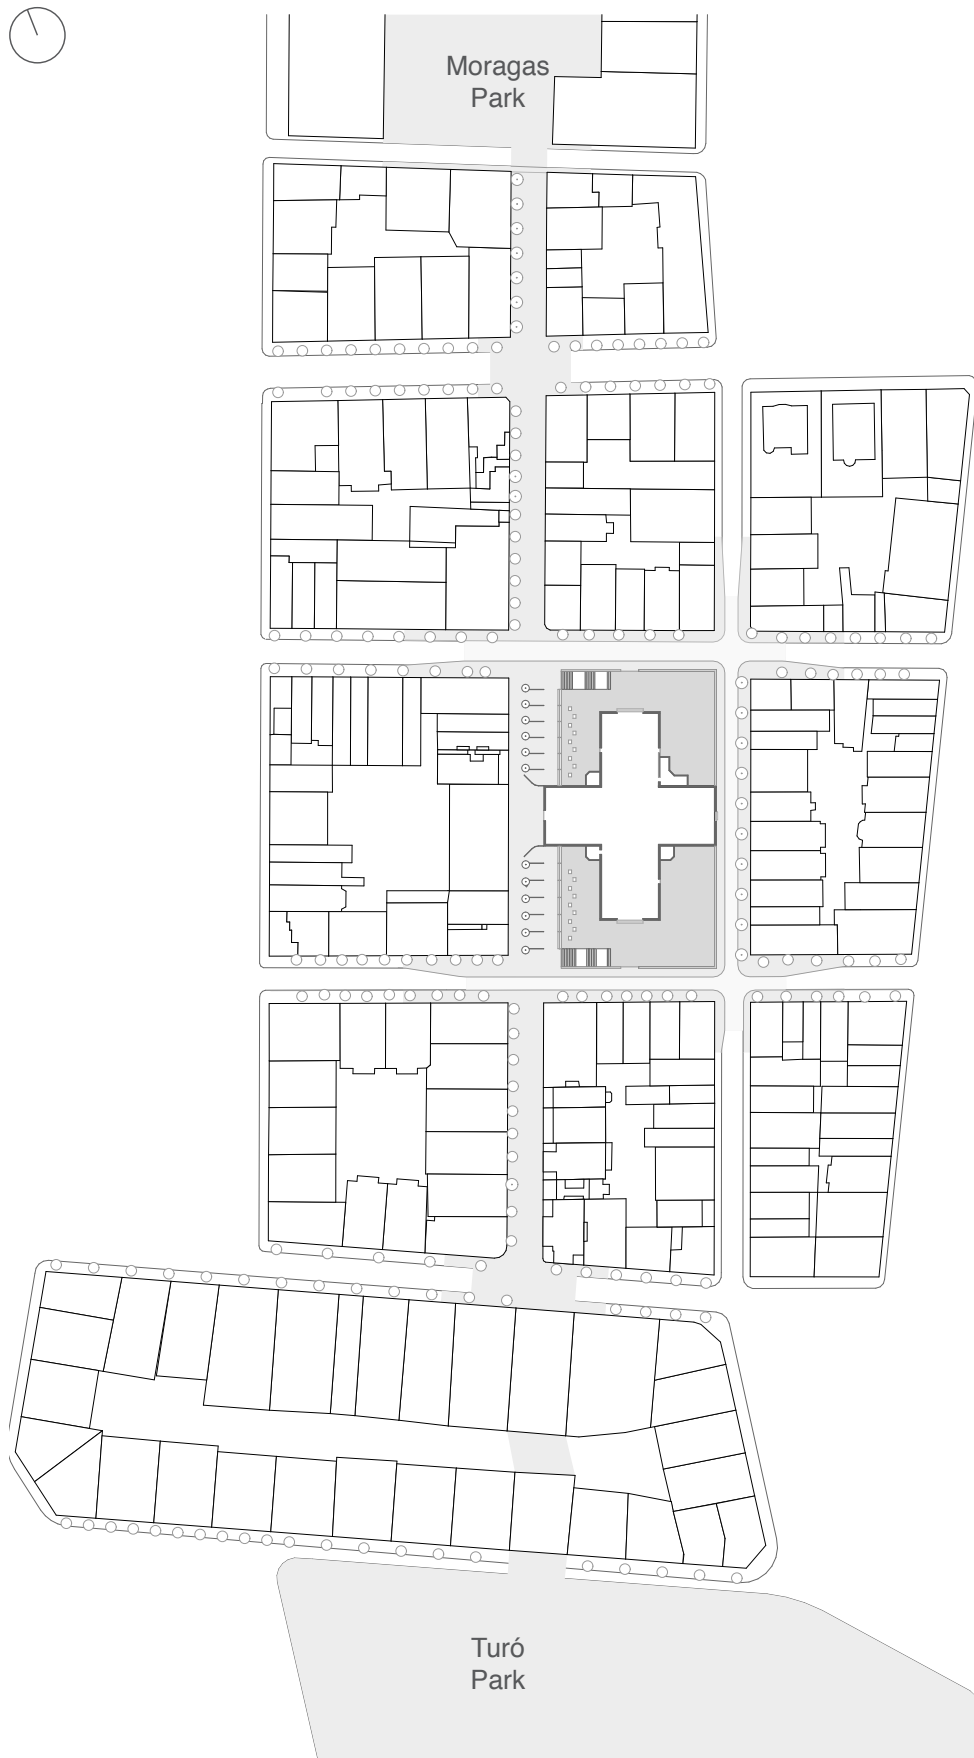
Neighborhood scale: floor plan. scale: 1:2500
